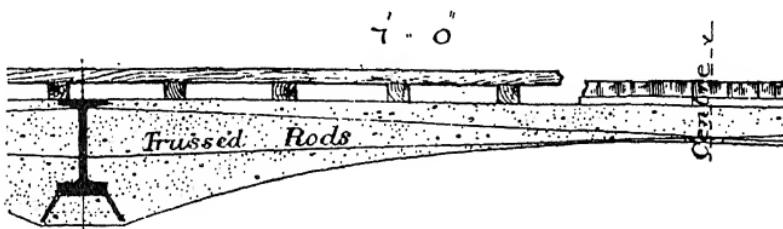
Lindsay, Neal, & Co.'s Skewback Girder and Arched Concrete Floor with Trussed Rods.
